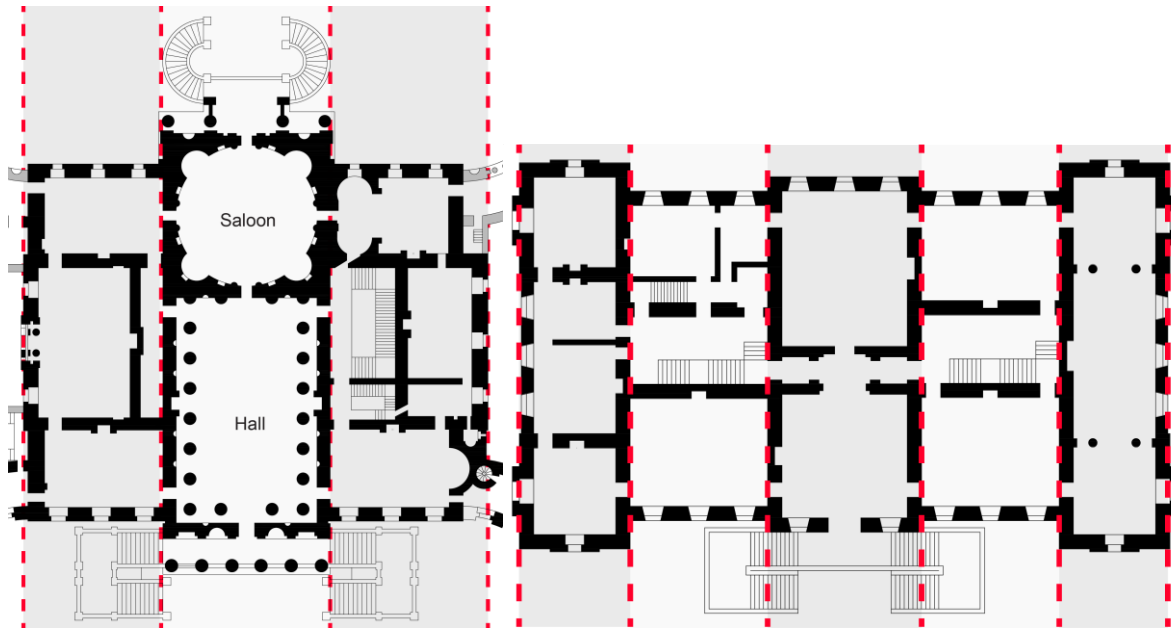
(left) Three-stripes-structure of the floor plan of the main floor of Kedleston Hall
